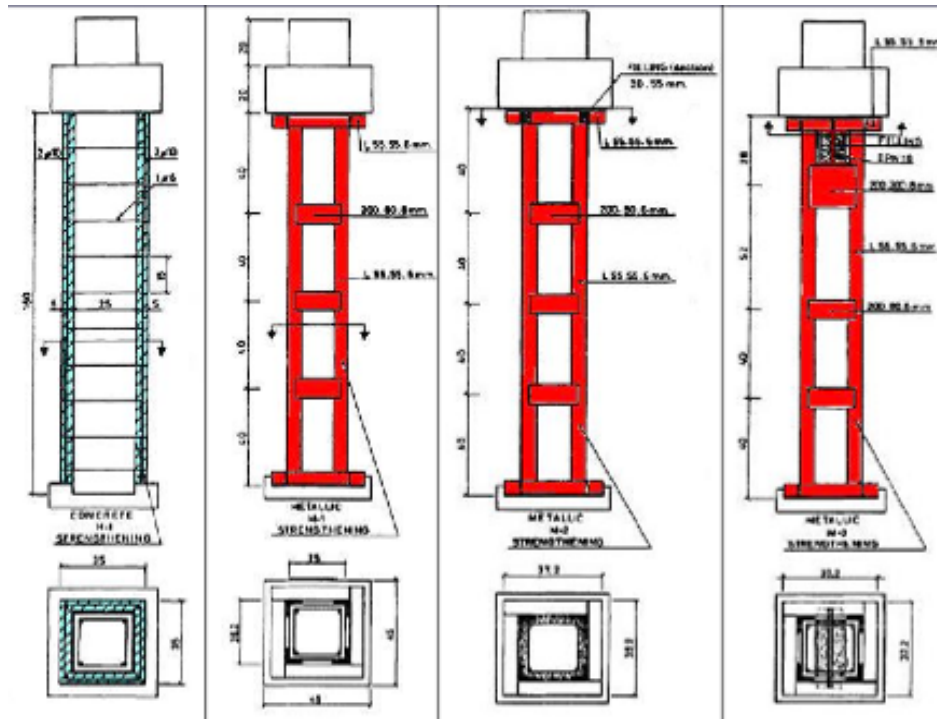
Ramirez's Full Column Repair Specimens<sup>75</sup>
